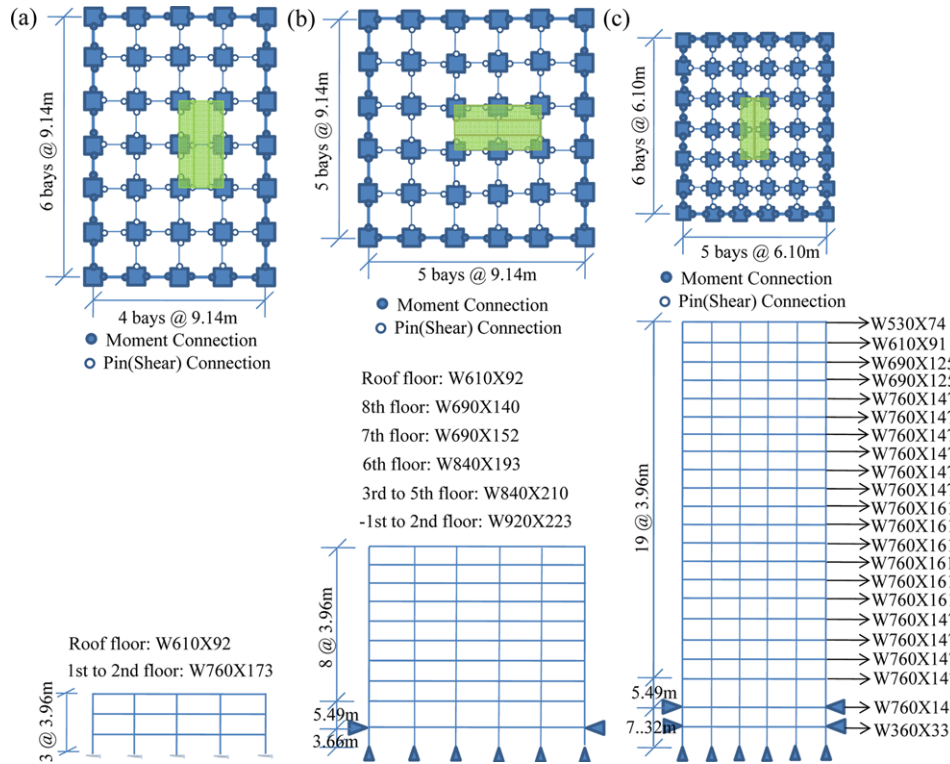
Floor Plans and Elevations for Composite-moment Frames: (a) 3 Story Bay, (b) 9 Story Bay, (c) 20 Story Bay
